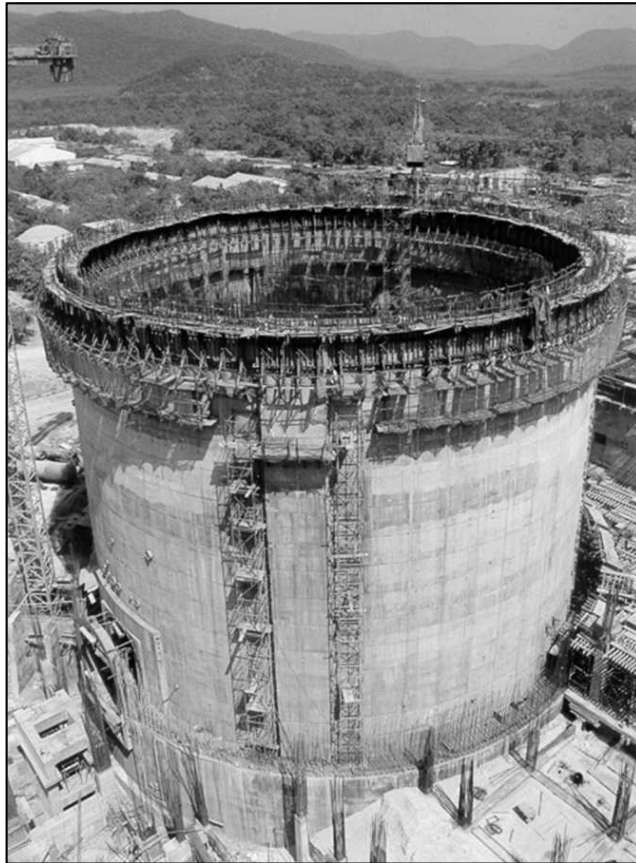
View of Containment Wall Under Construction at Kaiga Atomic Power Project. Construction by L&T Limited, ECC - Construction Group.
